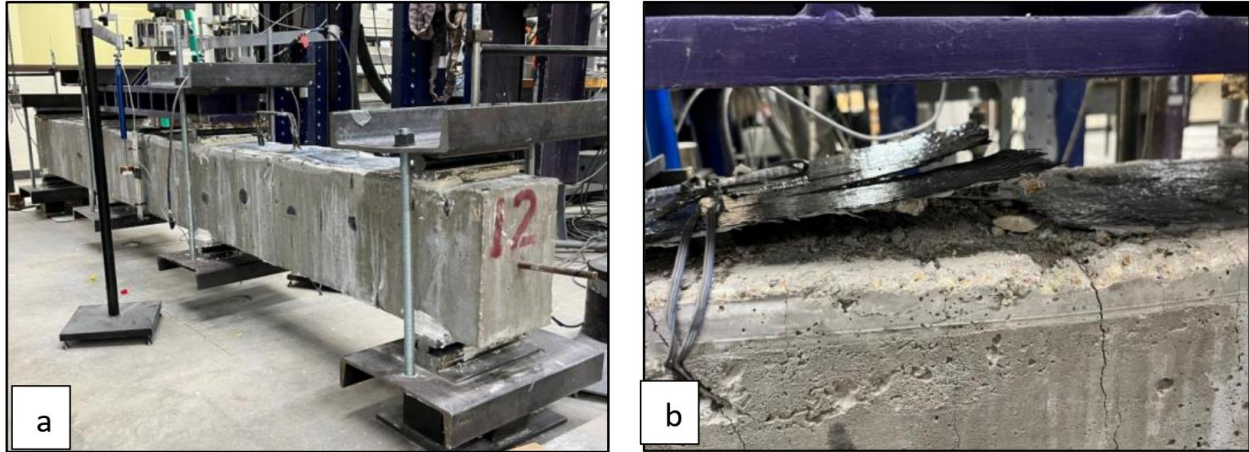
Specimen No.12. (a) before testing. (b) at failure
